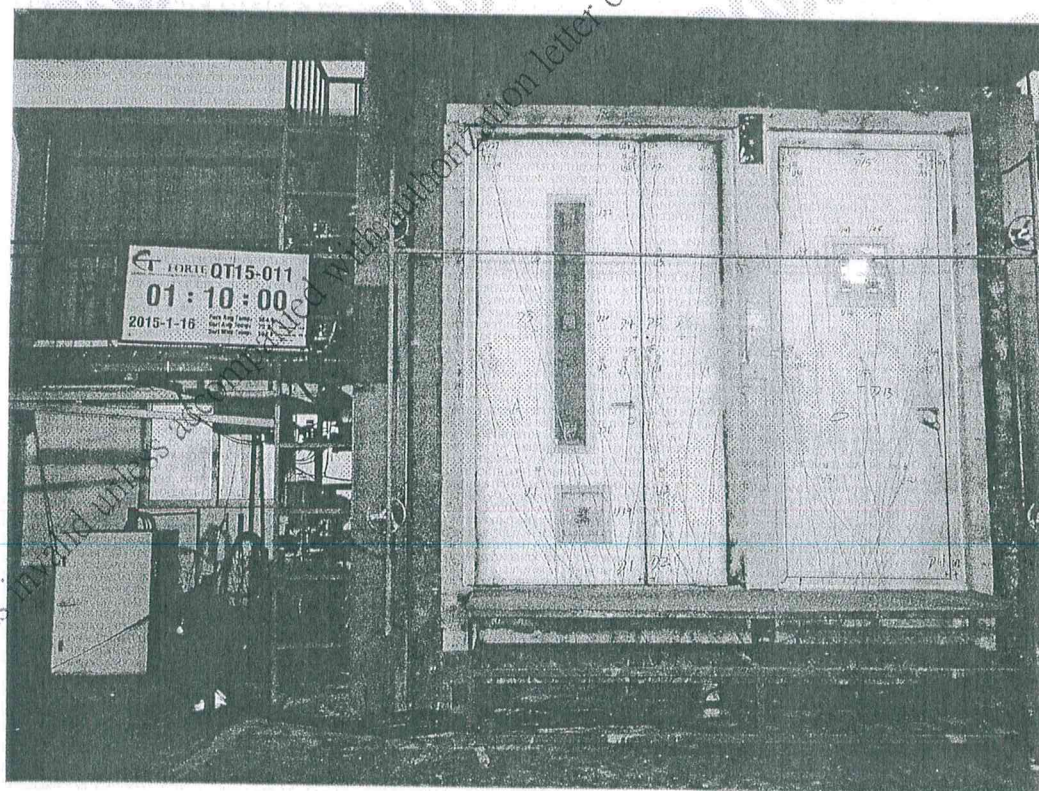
Unexposed surface of the specimen at 70 minute of test.
